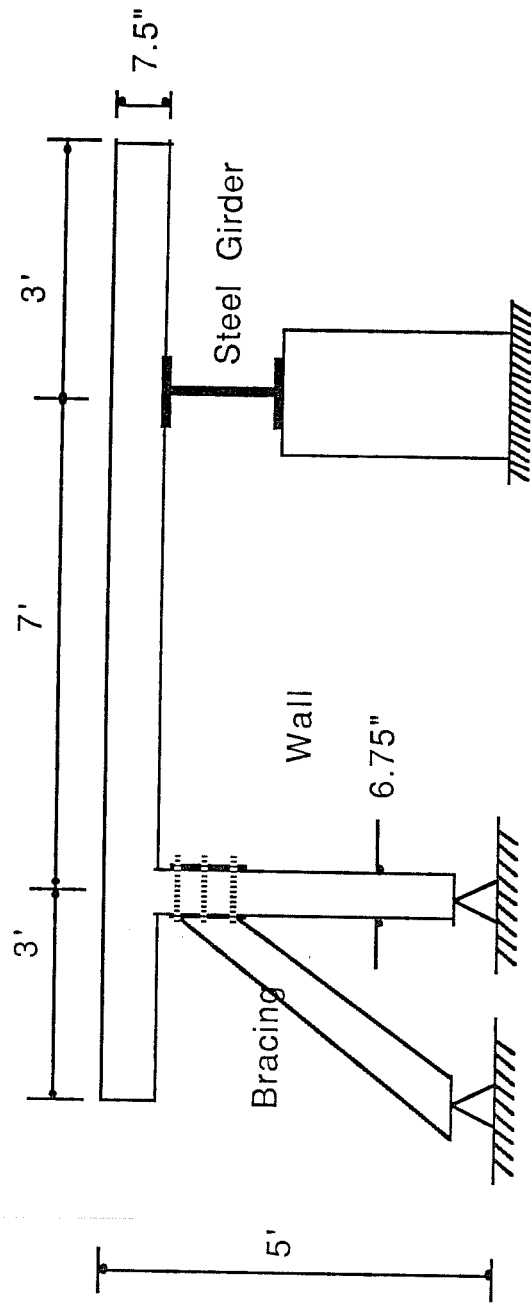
Elevation view of skew bridge model showing wall and lateral bracing
